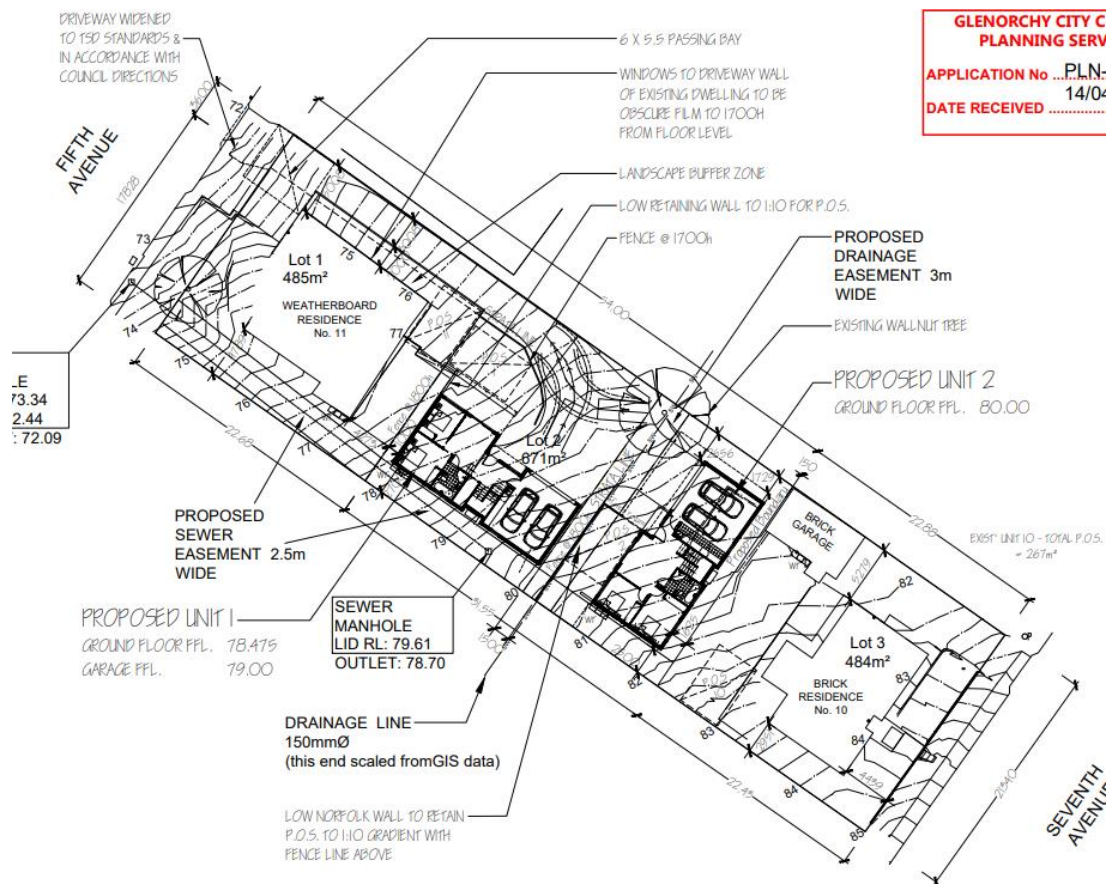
Proposed site plan showing two multiple dwellings within the proposed internal lot.
